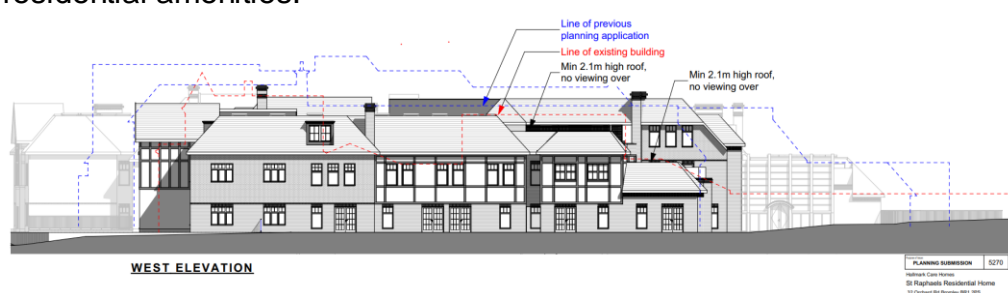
Proposed west elevation facing Ashmead Gate (Red line indicates existing. Blue line indicates previous dismissed scheme)
